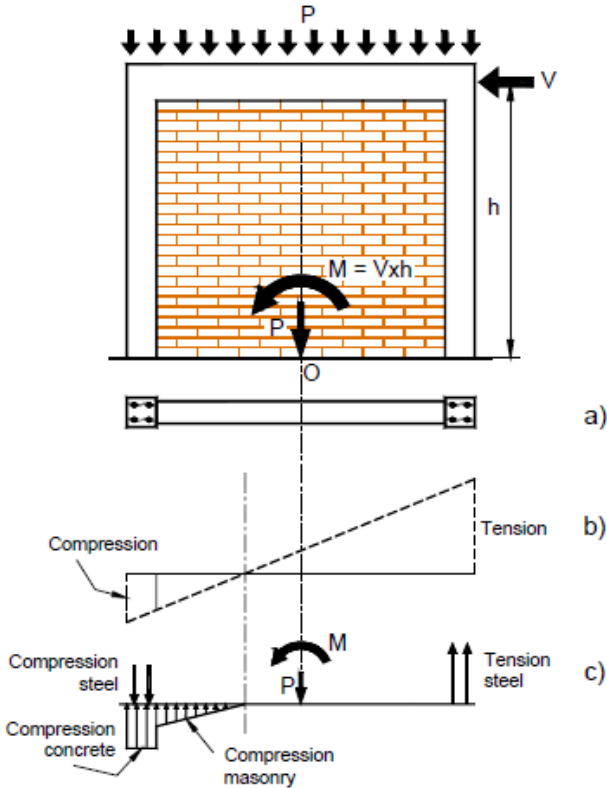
Confined masonry wall panel subjected to the combined axial load and bending: a) panel elevation and a typical cross-section; b) strain distribution, and c) internal force distribution. (Meli, 2011)
